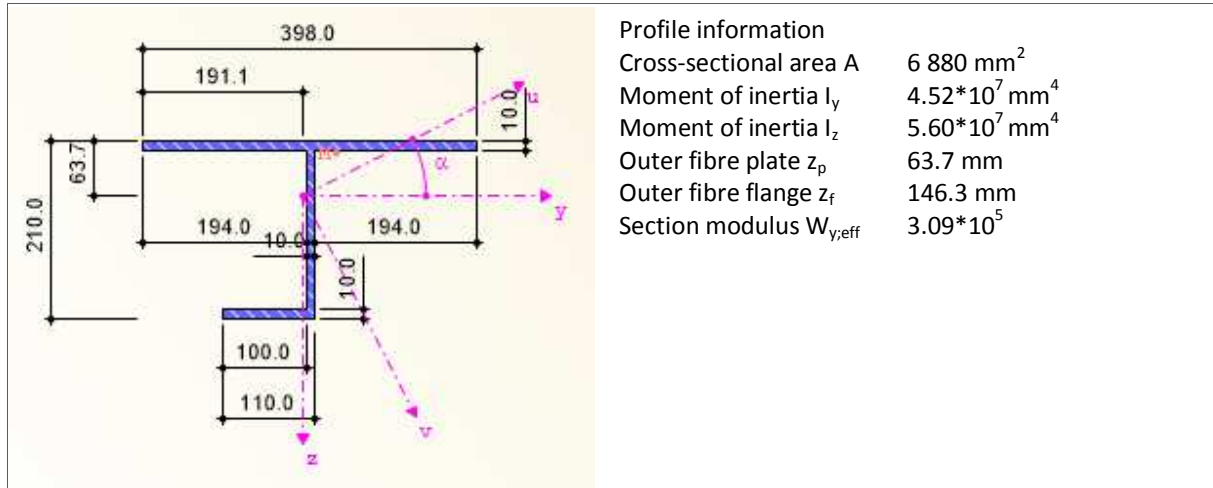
Welded steel section longitudinal stiffener, steel grade S235 and dimensions in mm
